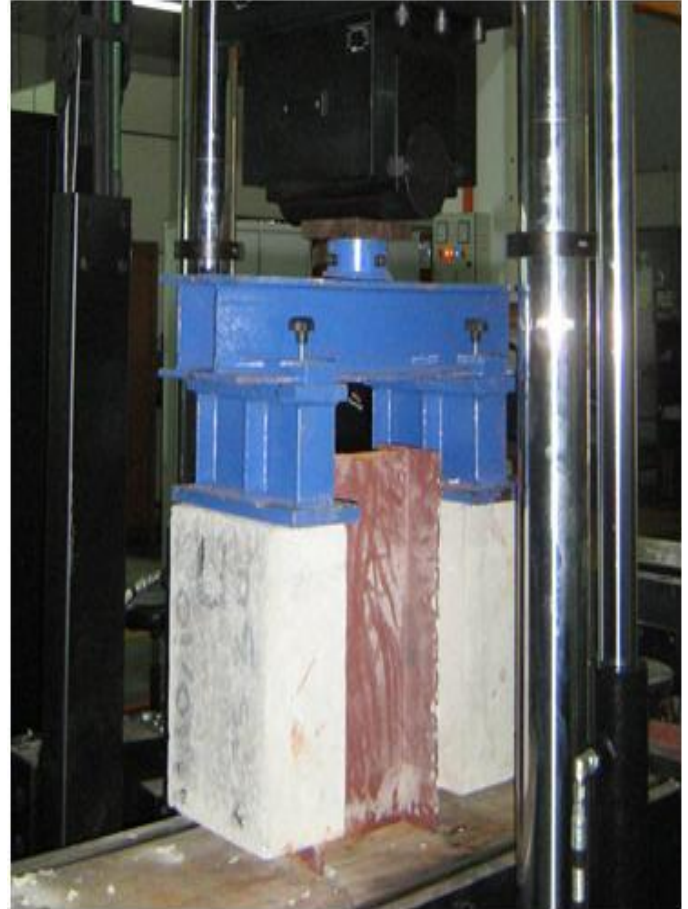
shows the typical schematic view of push-out specimens. The channel shear connectors were welded to the steel beam flanges and two concrete slabs were connected. The channel flanges were welded on all four sides. One channel had been provided, in each slab.
